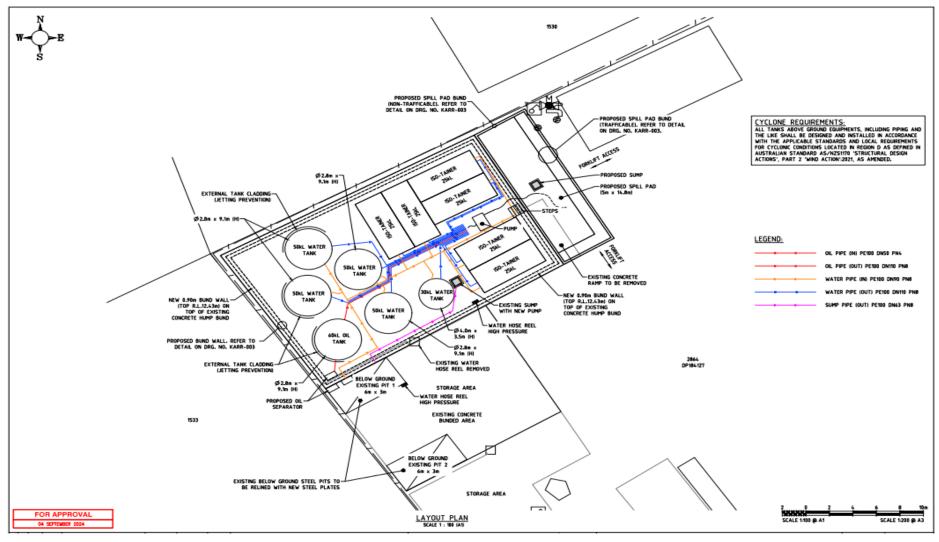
Pit 1 and Pit 2, Tank Farm, Oily water Separator and spill pad and sump layout.
